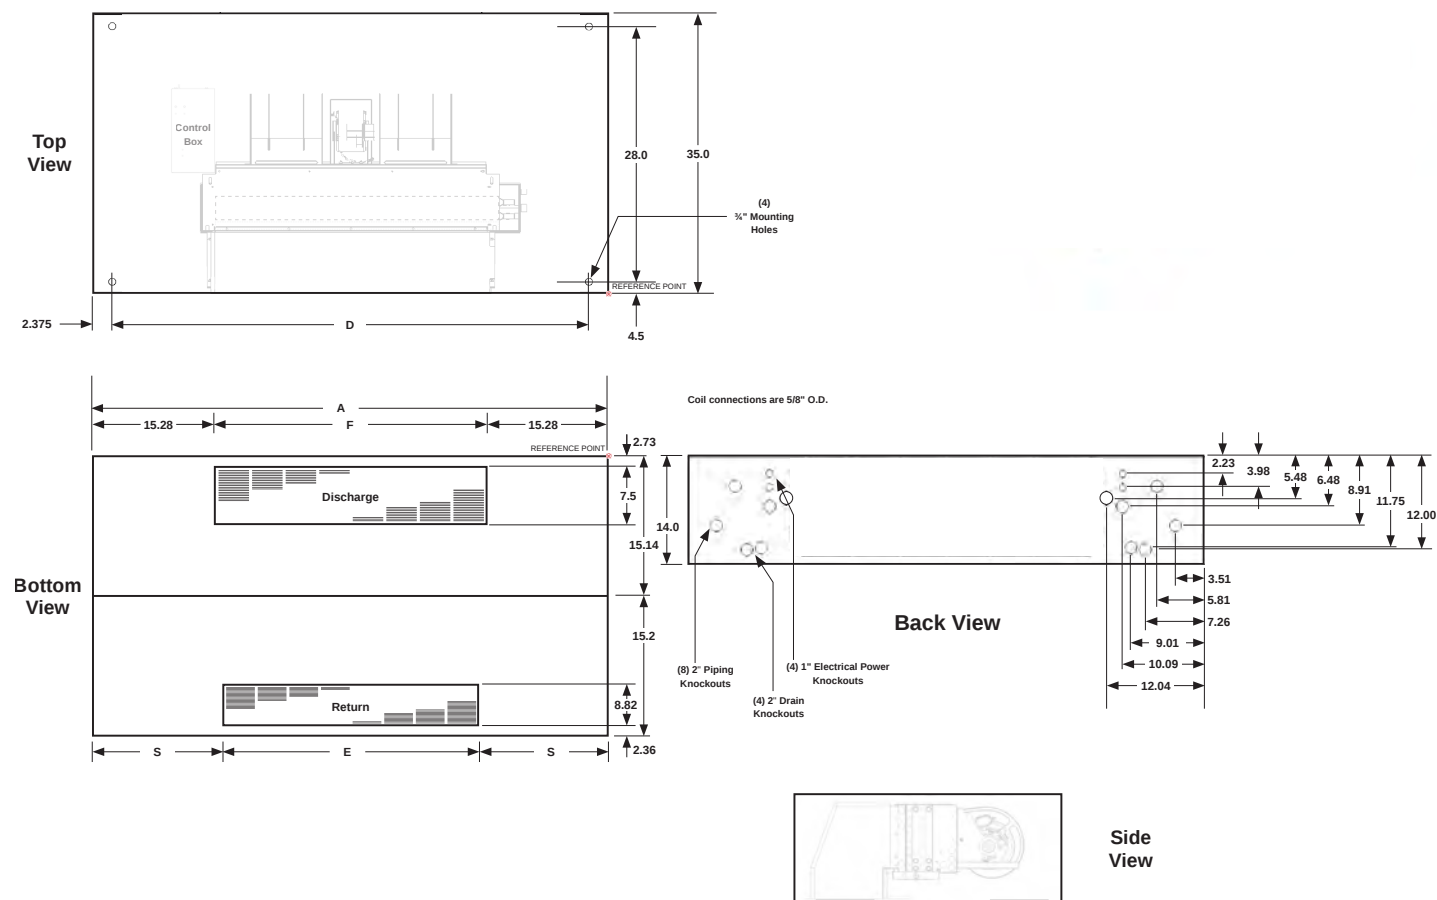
Dimensions – Cabinet fan coil, bottom discharge – rear return
